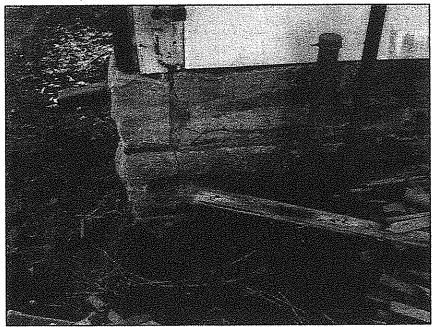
Cracked stone foundation wall at rear elevation.
